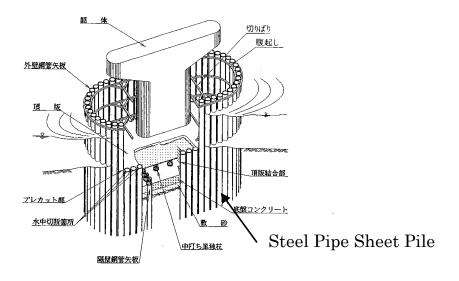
Schematic View of Steel Pipe Well Foundation
